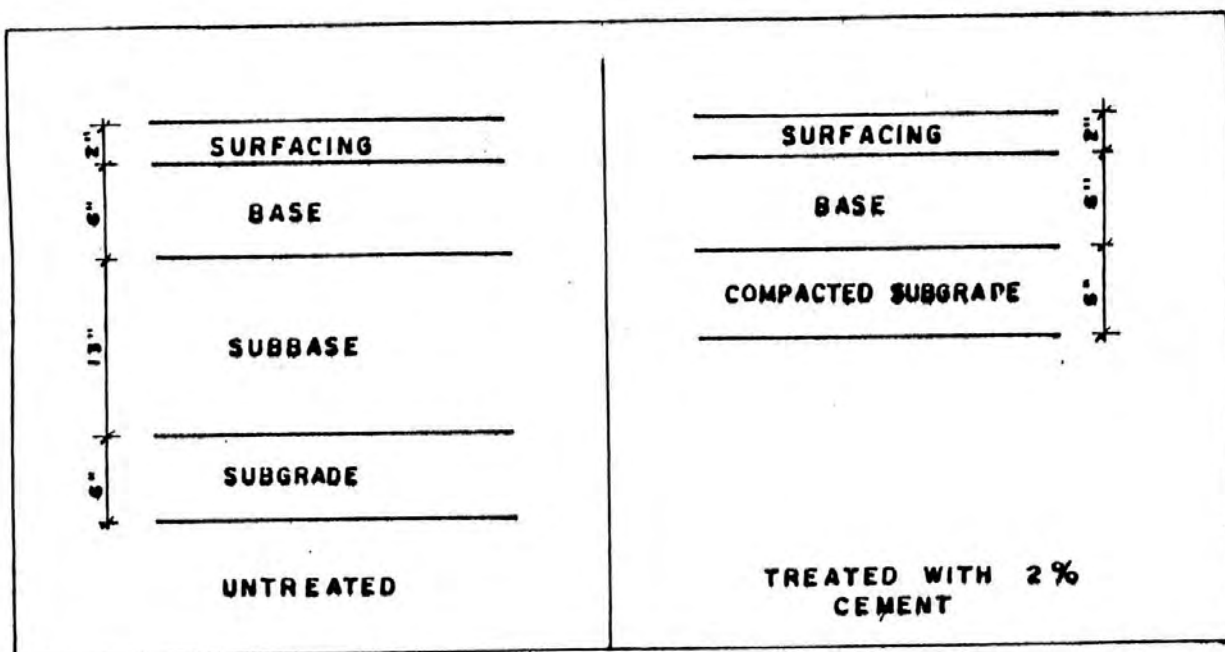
TRIAL SECTION, ROAD Note 31
